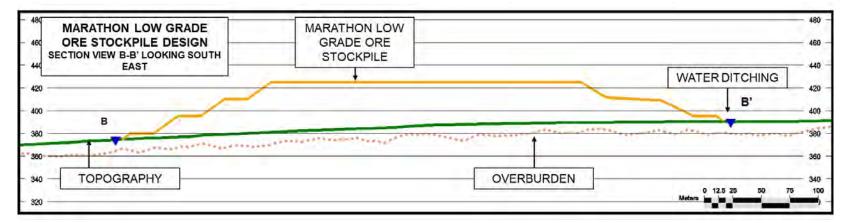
Marathon Low-grade Ore Stockpile Design – Section View B-B' Looking Southeast
